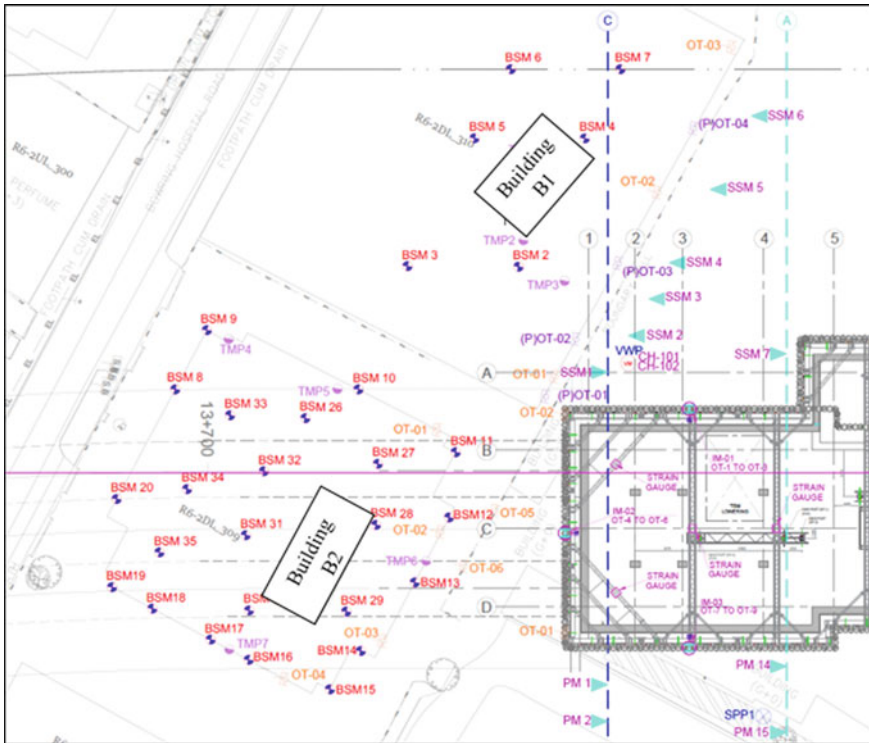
Plan and orientation of adjacent buildings and the instrumentation
